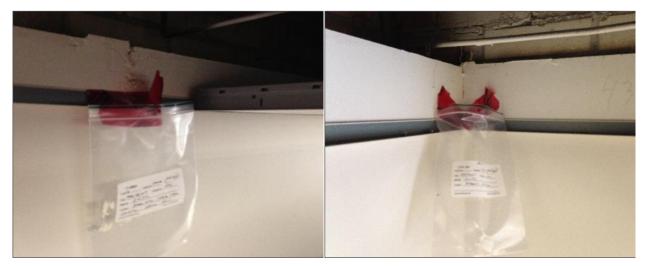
Drywall Joint Compound on walls (Sample S0001A-C) Boardroom
